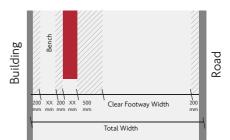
Examples of Location Where Bench Replaces Building Buffer
